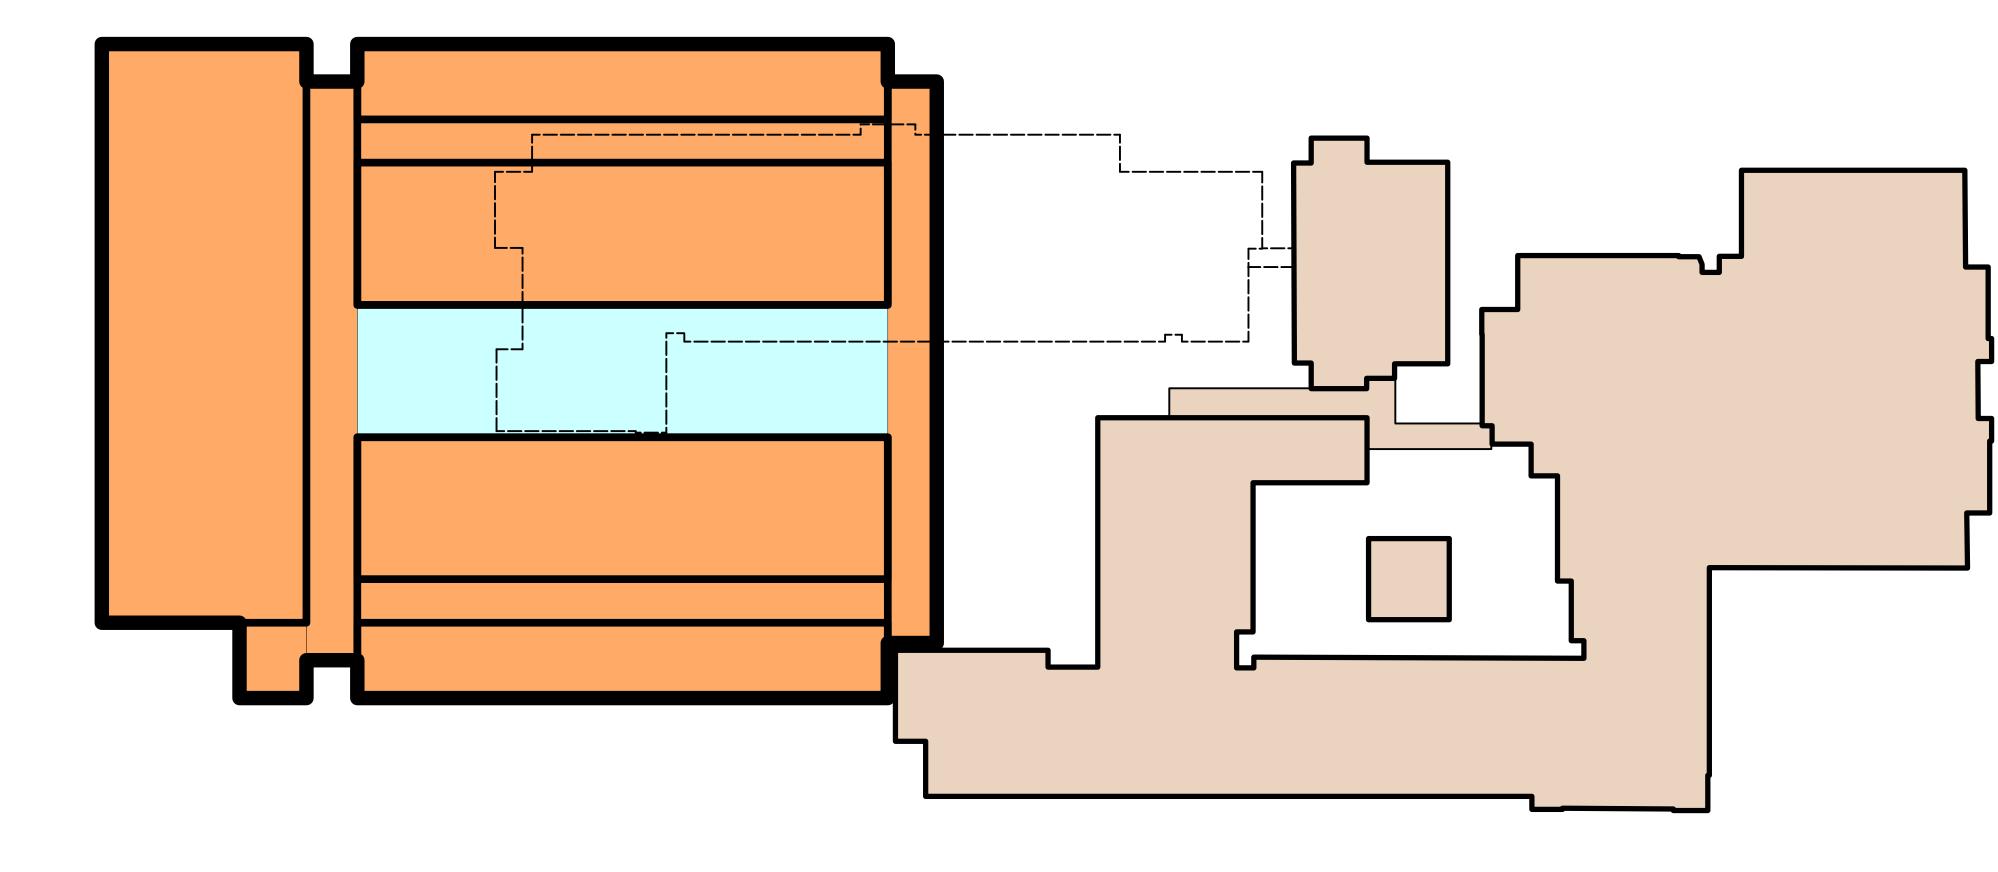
Site Development Plan - OPTION 4 SD68 NDSS SITE CORNERSTONE architecture & planning group
